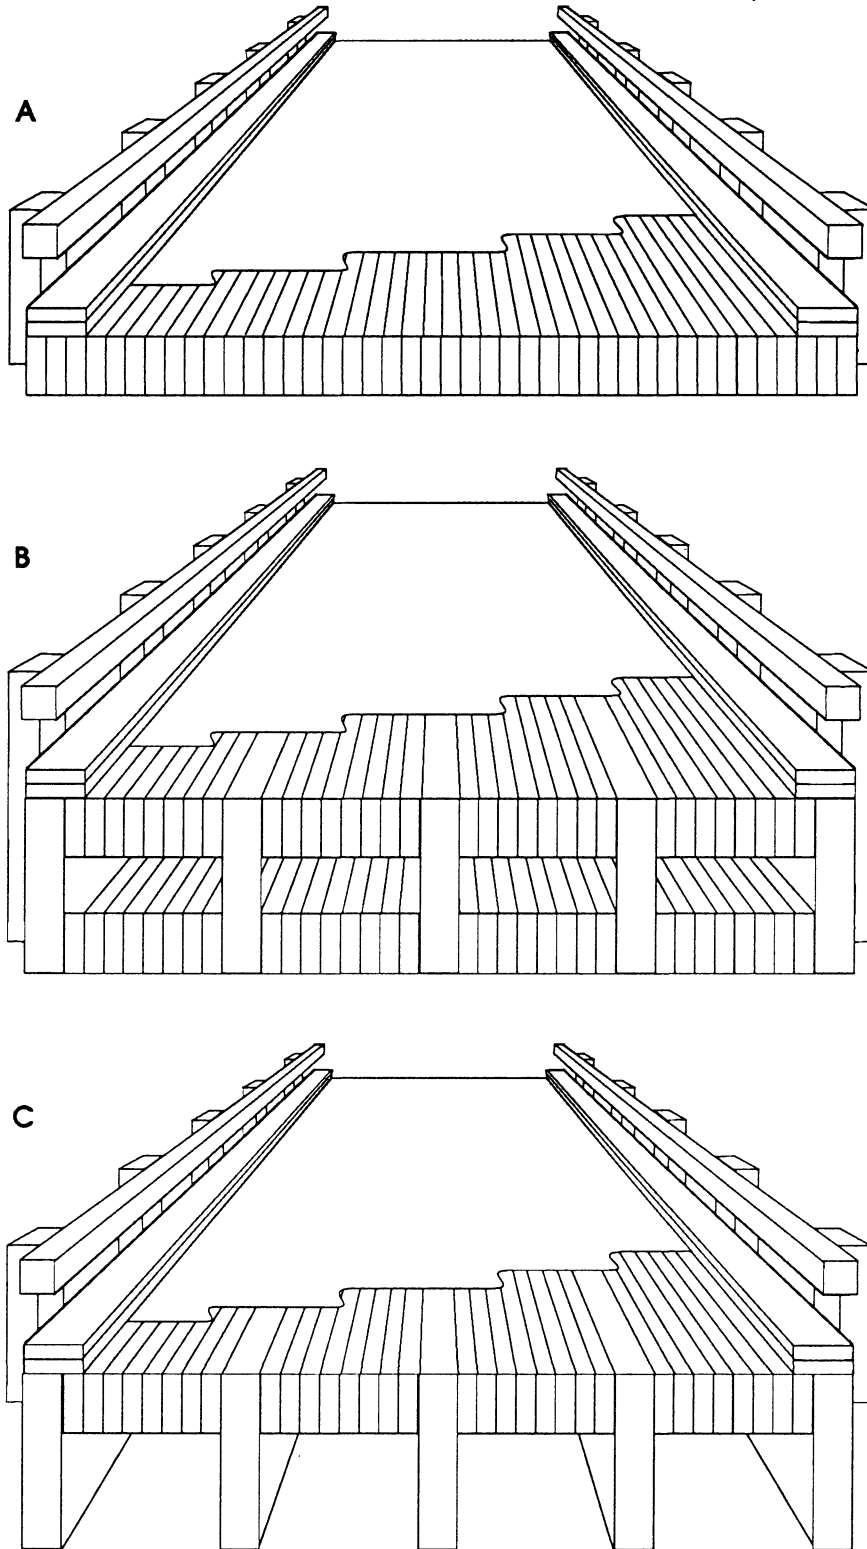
Configuration for Stressed-Laminated Timber Bridges. A. Basic. B. Box Section. C. "T" Section. Reprinted with permission from Ganga Rao.<sup>3</sup>
